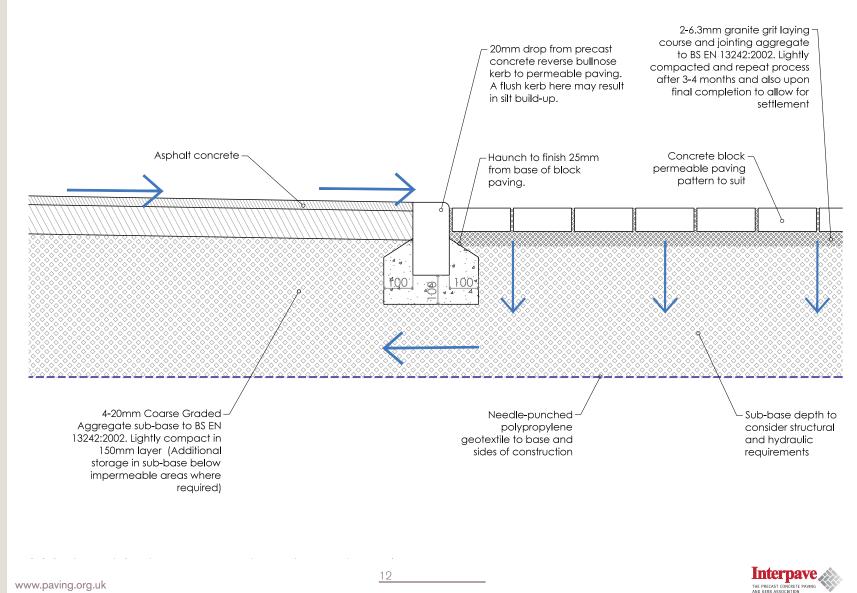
Lined Permeable Paving (System C) - Edge Detail Between Lined Permeable Paving and Service Strip, Incorporating Asphalt Concrete
